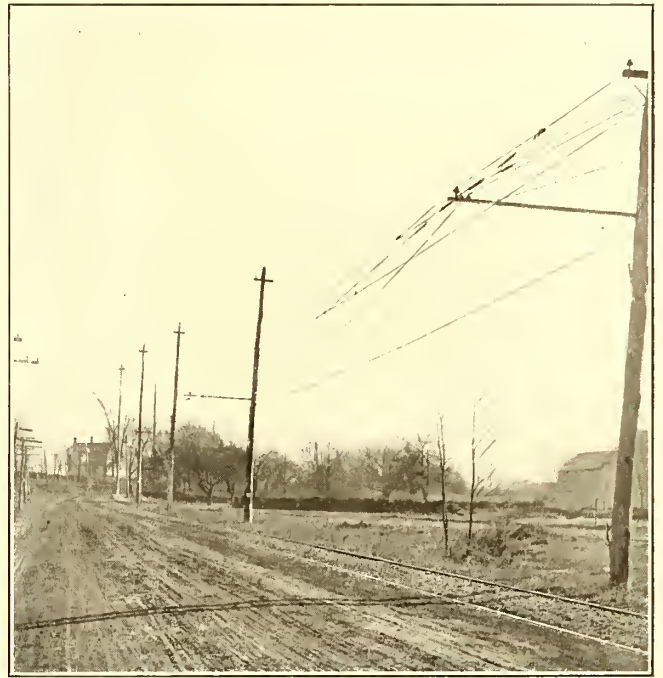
Shore Line Railway—Overhead Construction at an Anchorage
